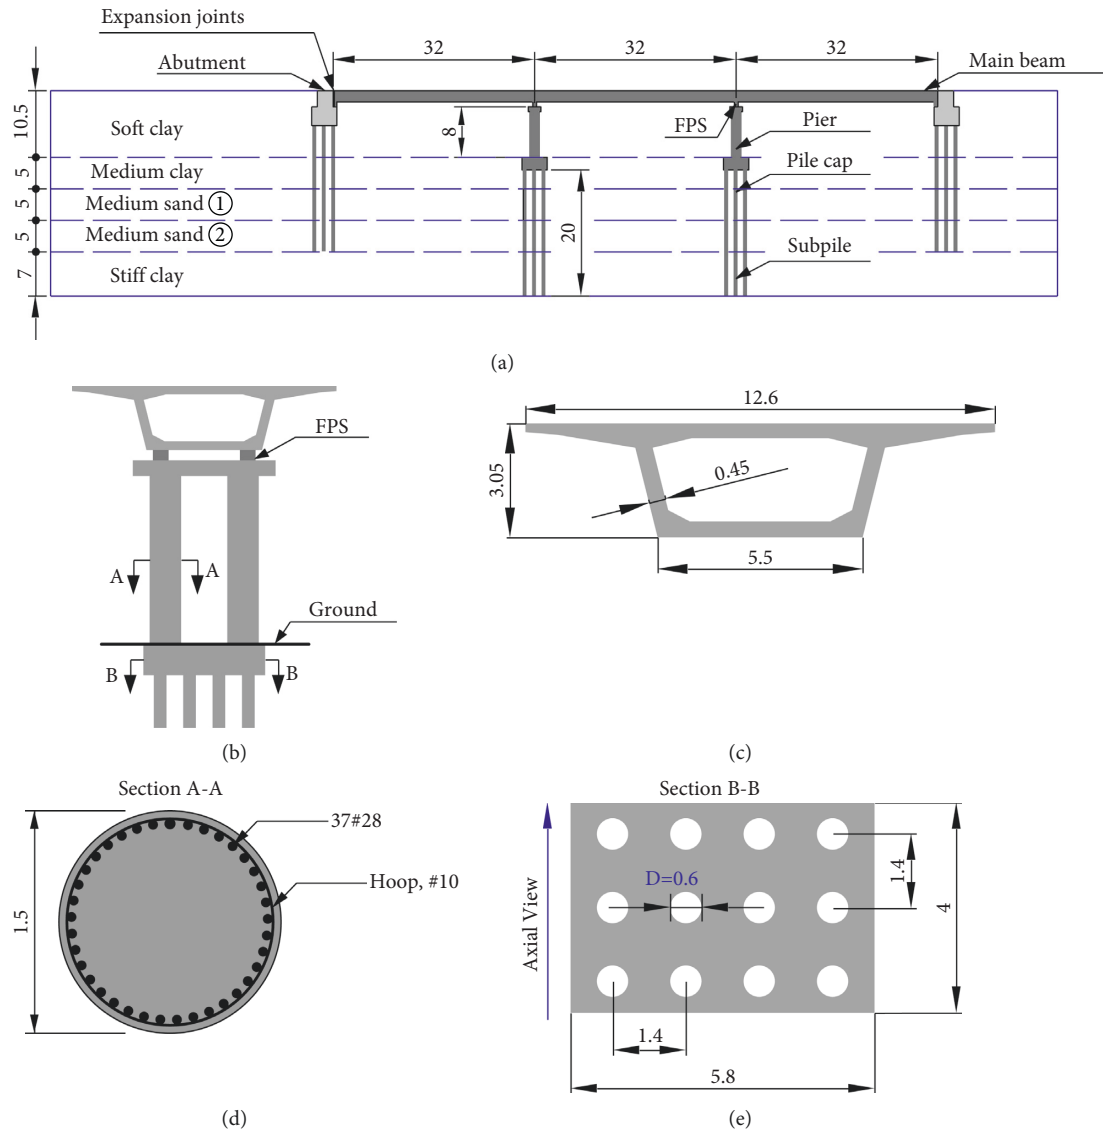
The configuration of typical concrete continuous bridge. (a) Side view of the bridge elevation and four-layer soil profile. (b) Axial view of the bridge structures. (c) Cross section of the main beam. (d) Cross section of a single pier. (e) Cross section of the pile cap and 12 subpiles. Dimensions are in m.
